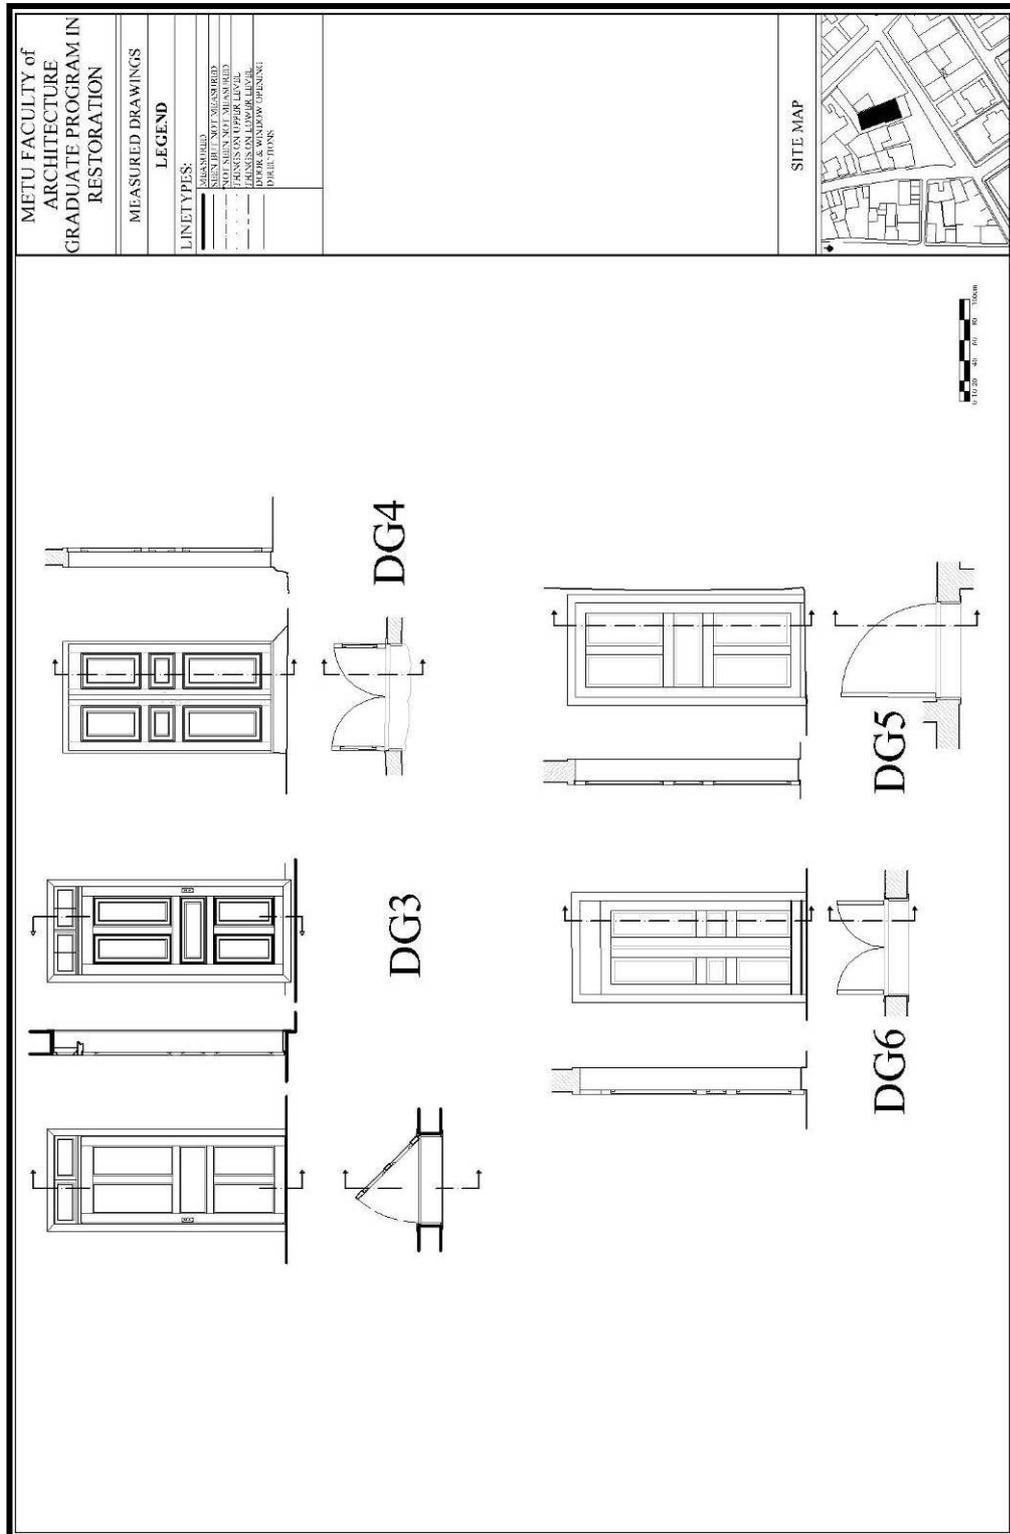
Detail Drawings; Doors of G round Floor (Continued)
